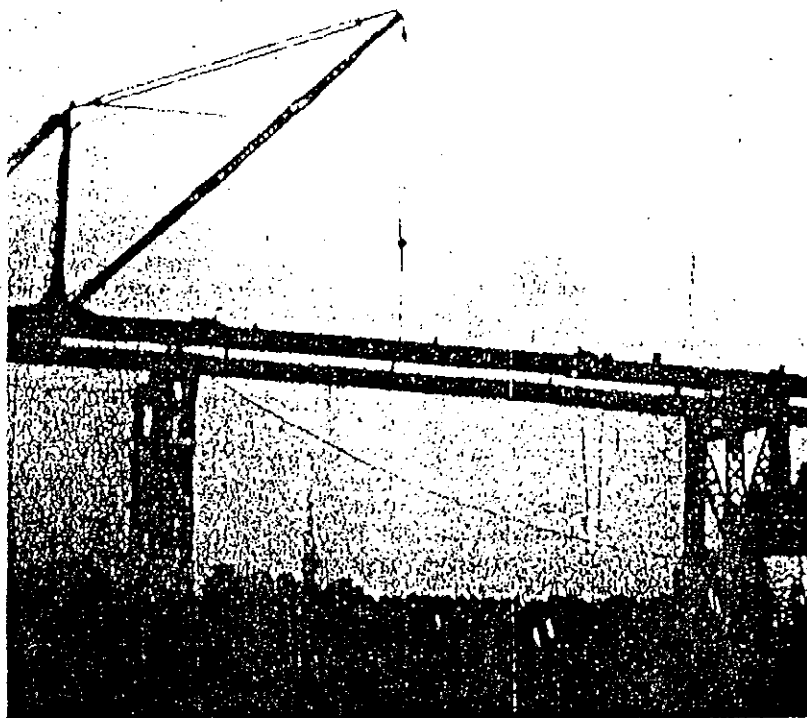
Erection of closing section of stiffening girder. Falsework bents at 50-ft. centers supported structure during erection.
